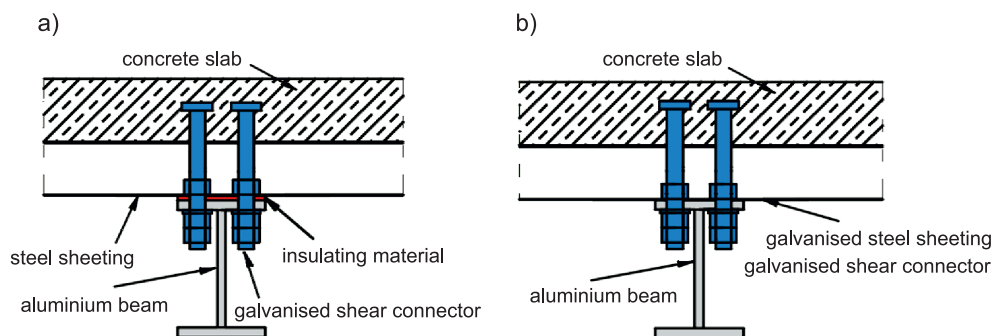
A corrosion protection of the aluminium beam: a) when steel sheeting is not galvanised; b) when steel sheeting is galvanised
